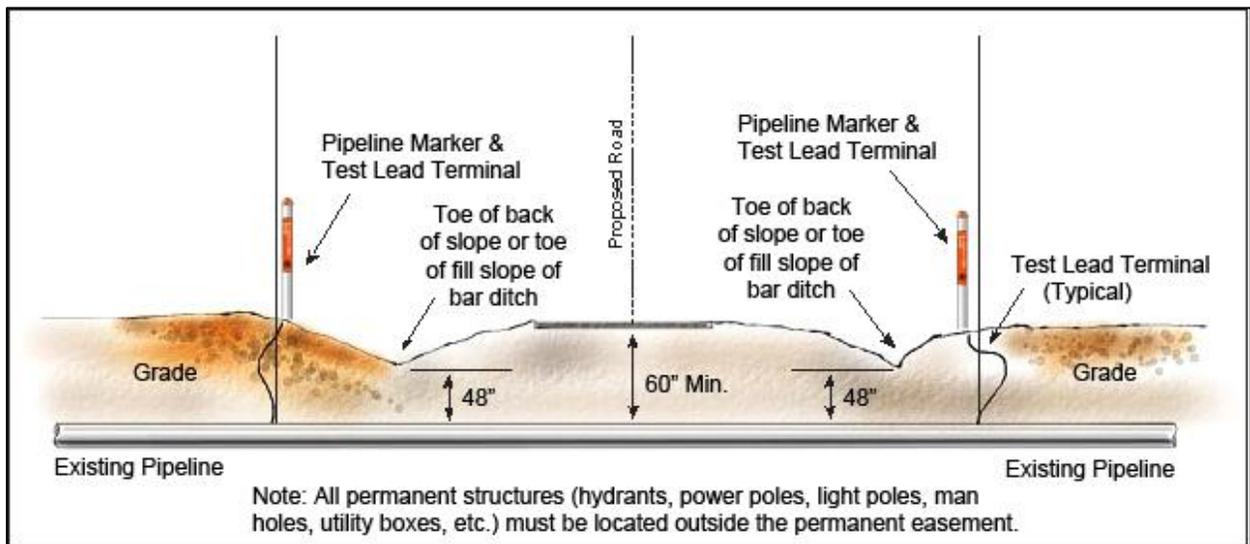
TYPICAL PROFILE DATA FOR PROPOSED ROAD CROSSING AND PARKING LOT.
